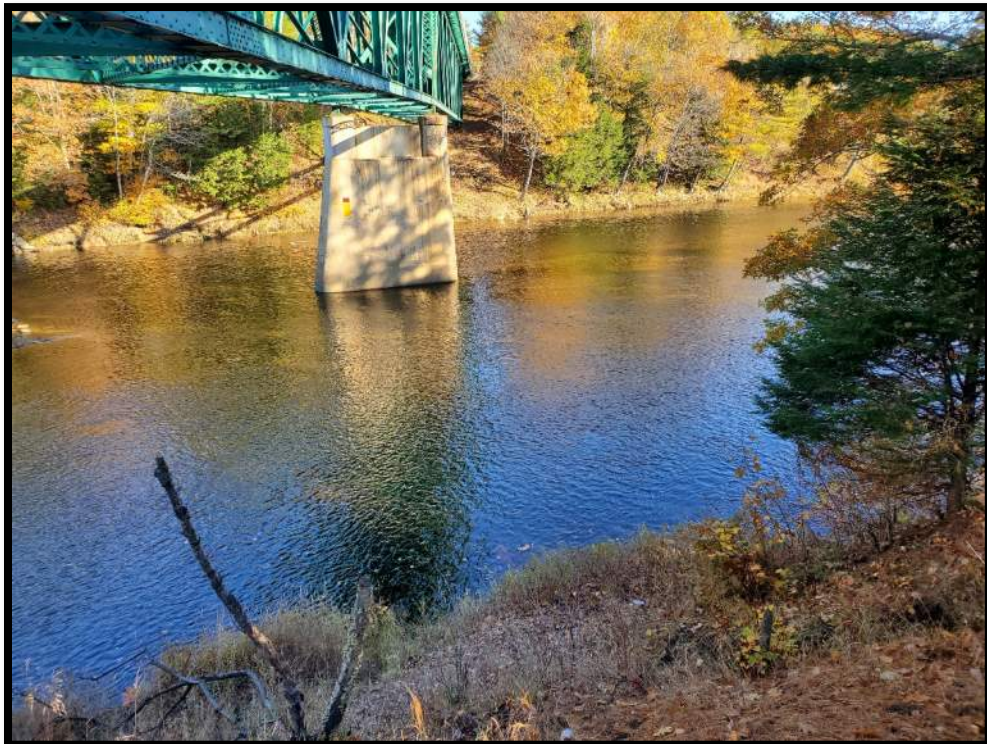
Downstream of Bridge West Bank Facing Across River– 10/19/2022
